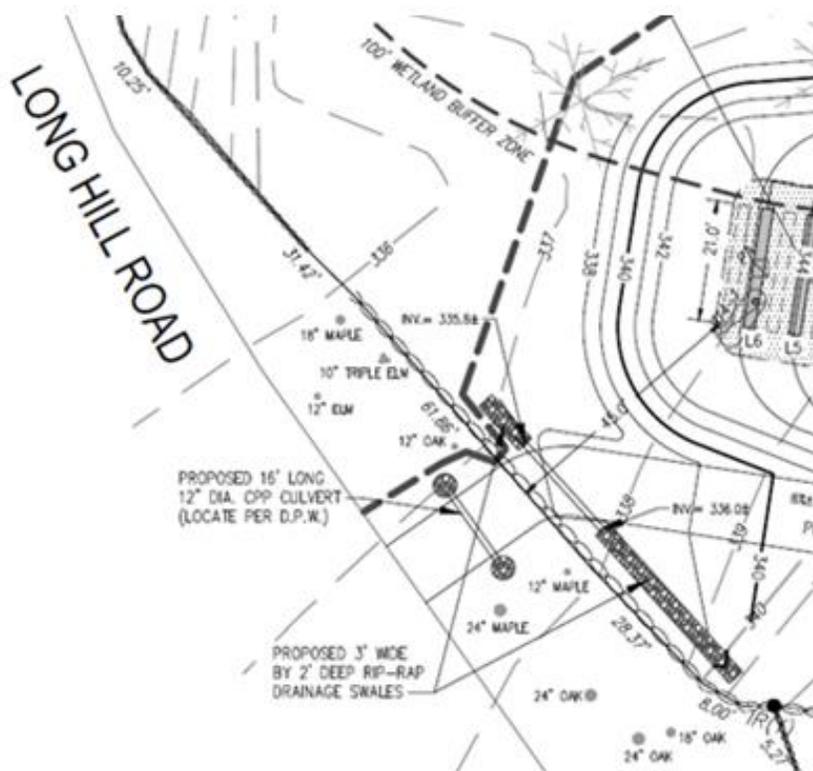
Closeup of Site Plan Showing Frontage to Long Hill Road and Distance Between Driveway and Lot Lines
